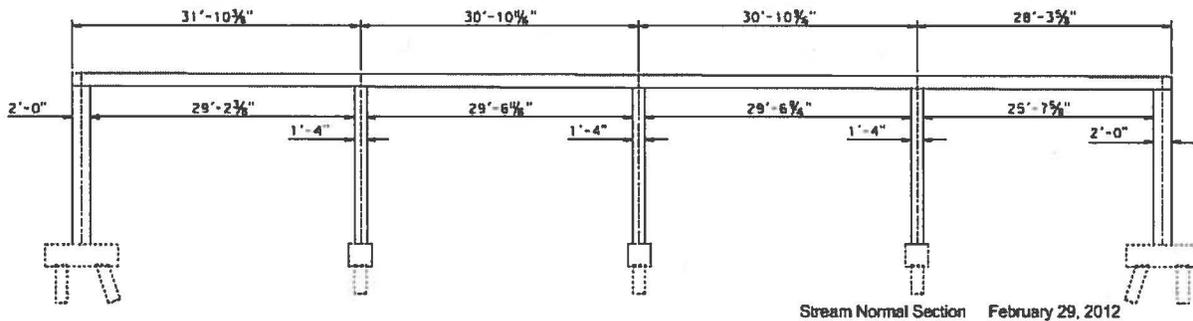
Proposed San Francisquito Creek Bridge, Normal to Channel Details
